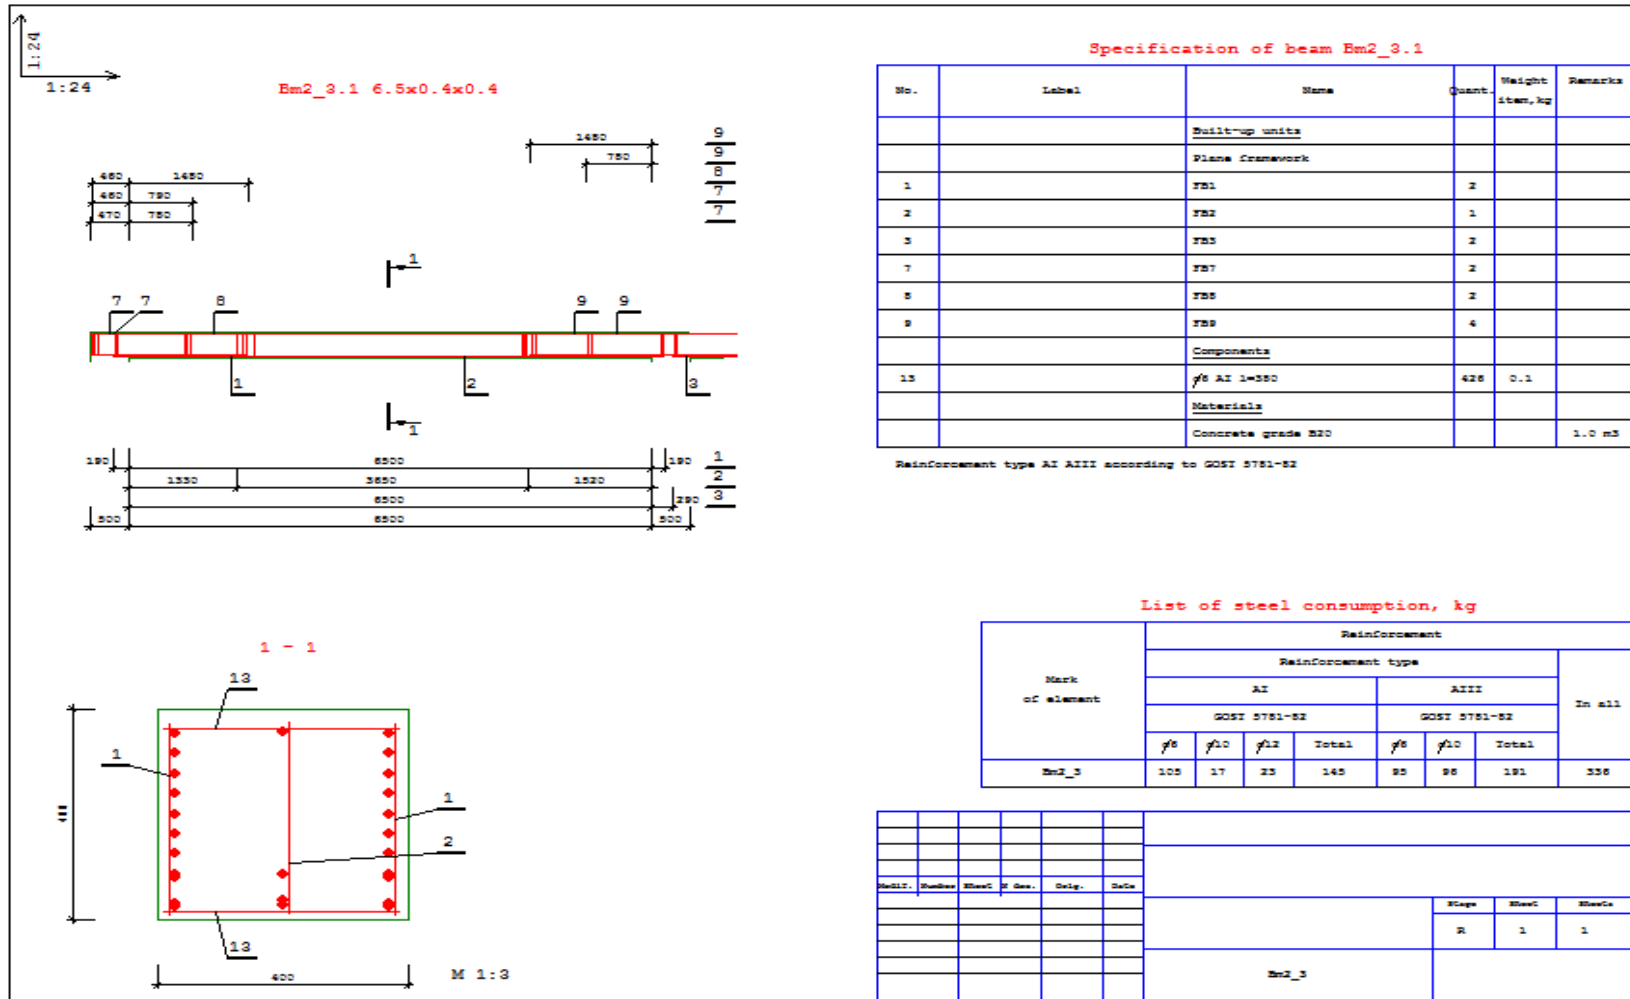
Variant of a building with a beam - slab floor. Beam B2-3. Working project drawings
